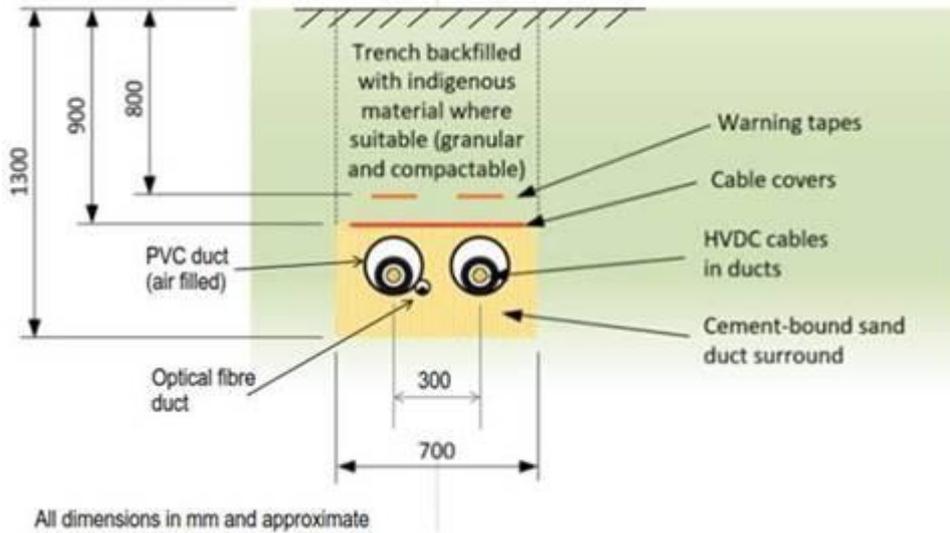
Typical HVDC Trench Cross-Section (source: WSP | not to scale)
